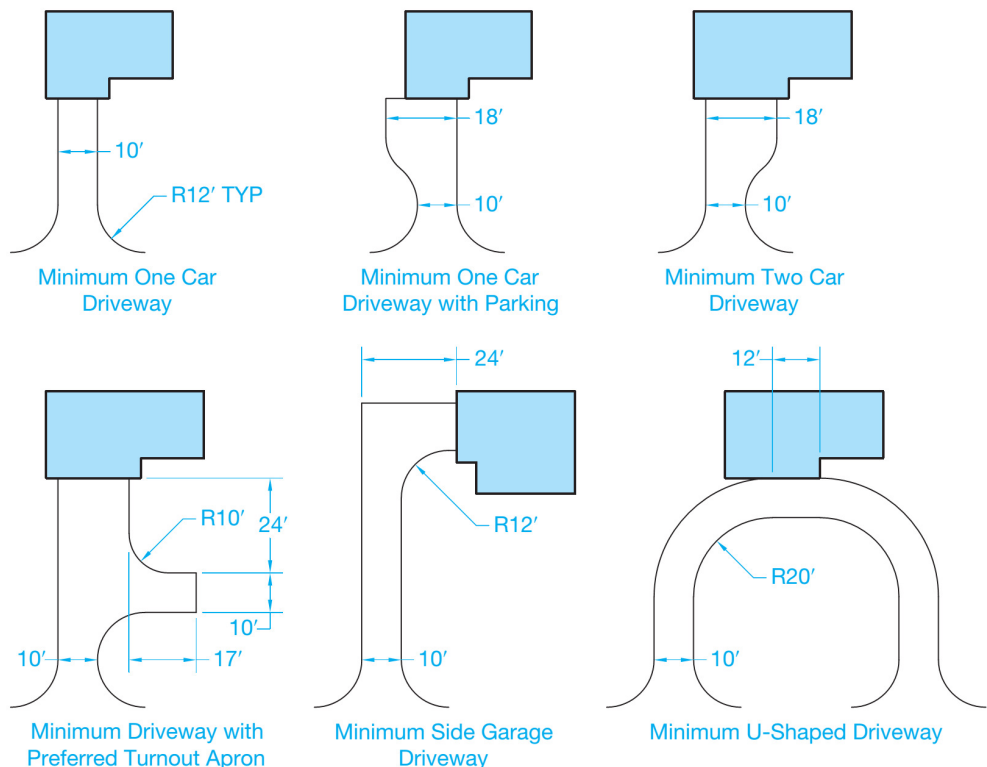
A variety of driveway layouts. The dimensions are given as commonly recommended minimums for small- to standard-sized cars. Additional room should be provided, if available.
